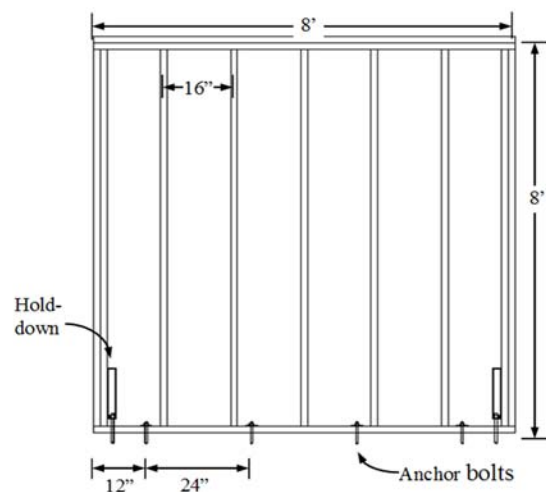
Example Drawing for AC269.1 Wall Type 1 Specimen
